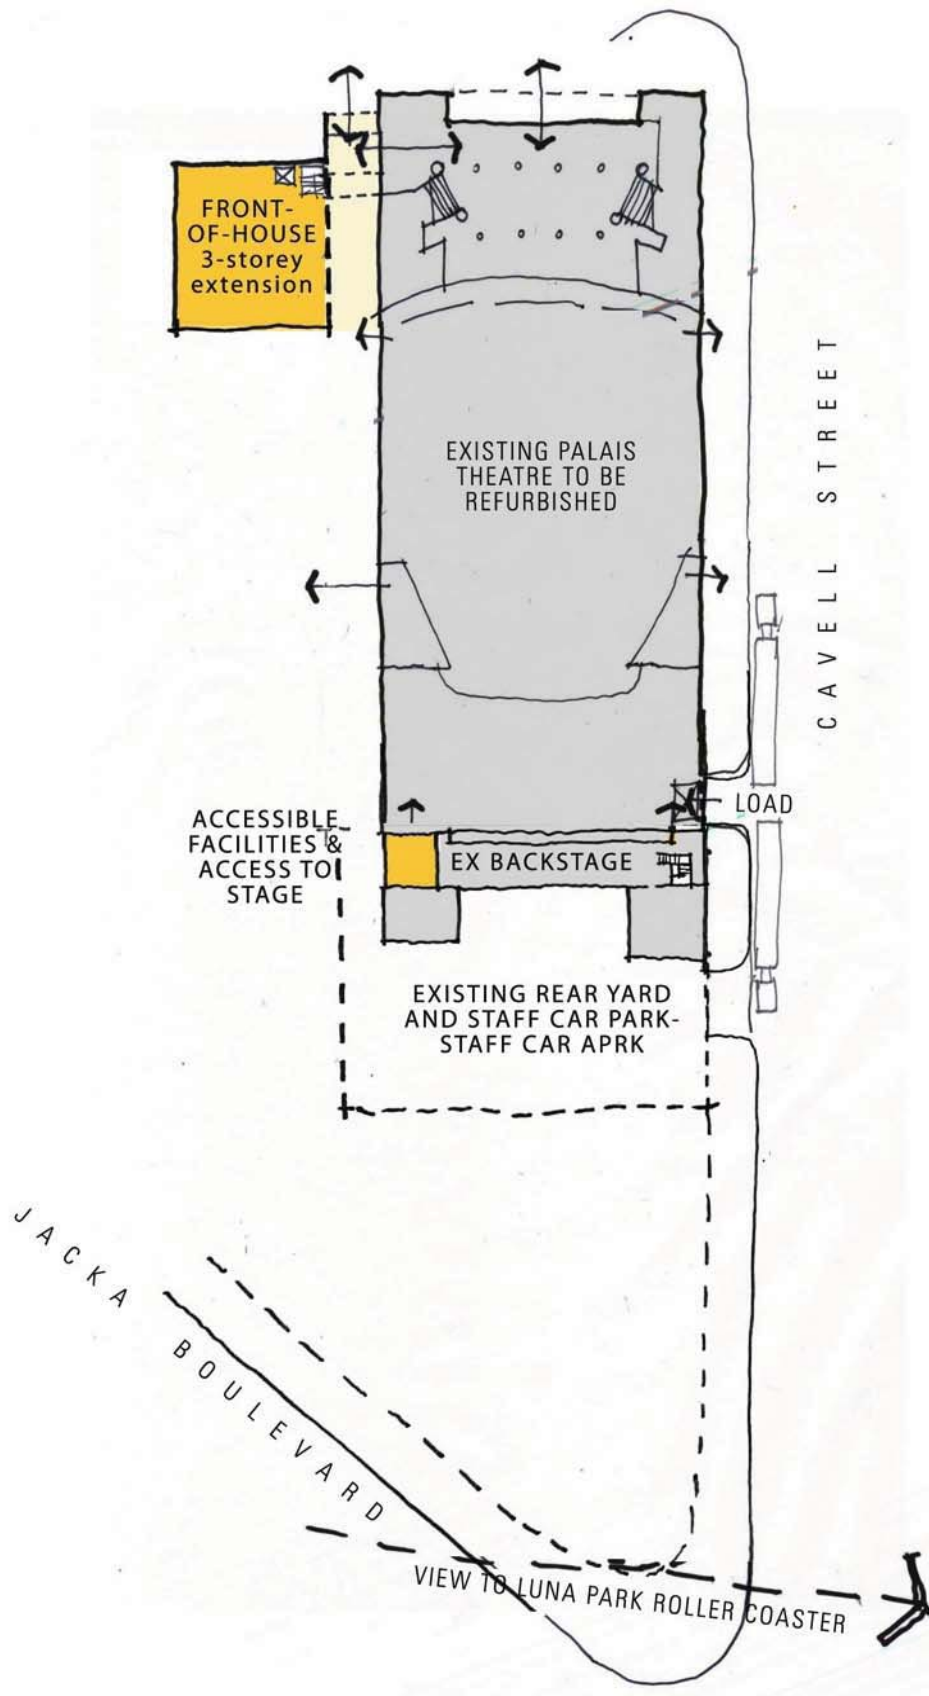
Indicative layout for Upgrade 1A - Minimum upgrade
